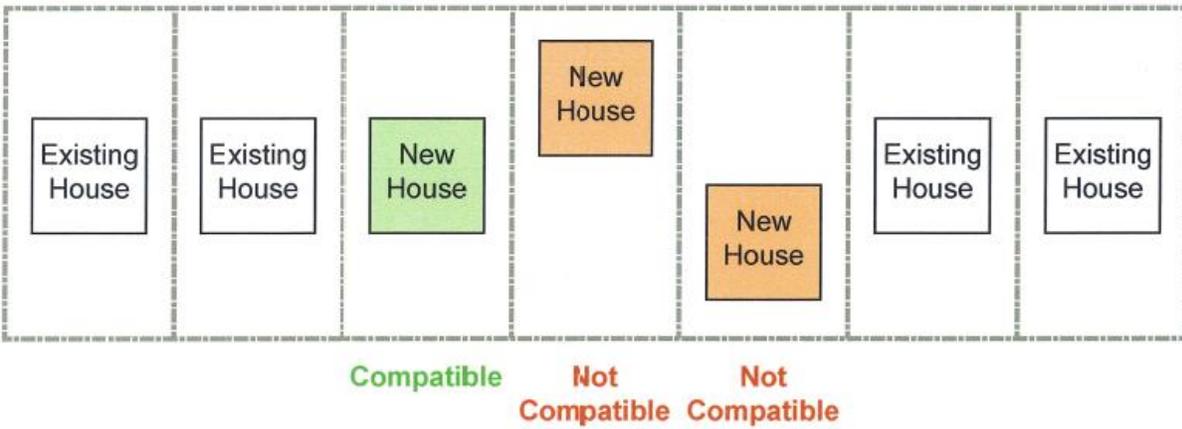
In neighborhood where existing homes have consistent setbacks, new construction should match the siting of adjacent home.
